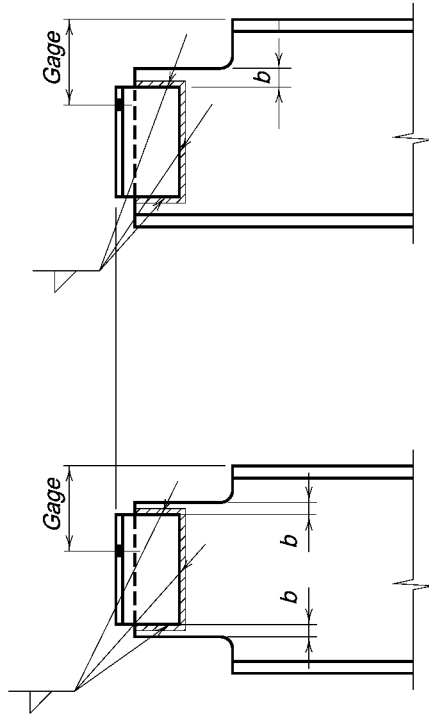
Illustration of shelf dimensions for fillet welding.
